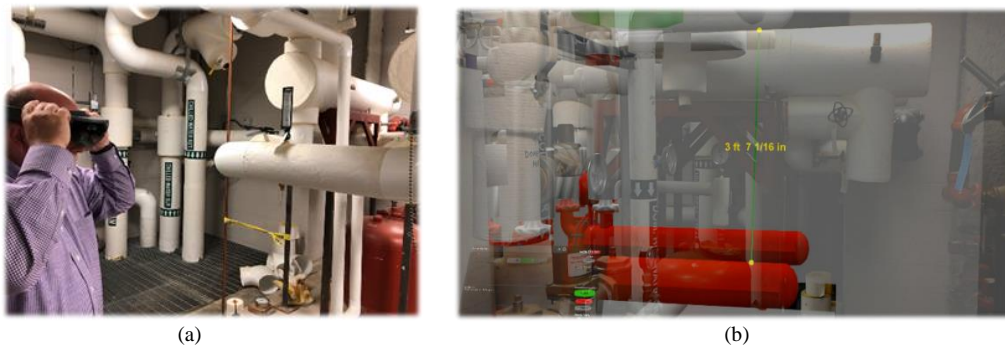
Using the HoloLens with HoloLive Measuring Tool
